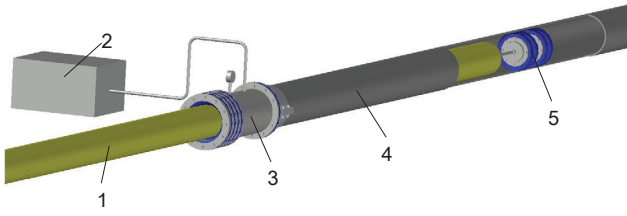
Pulling of a new polyethylene pipeline into worn-out steel by the pig: 1 – polyethylene pulling pipeline; 2 – compressor; 3 – sealing system; 4 – worn-out steel pipe; 5 – pig
